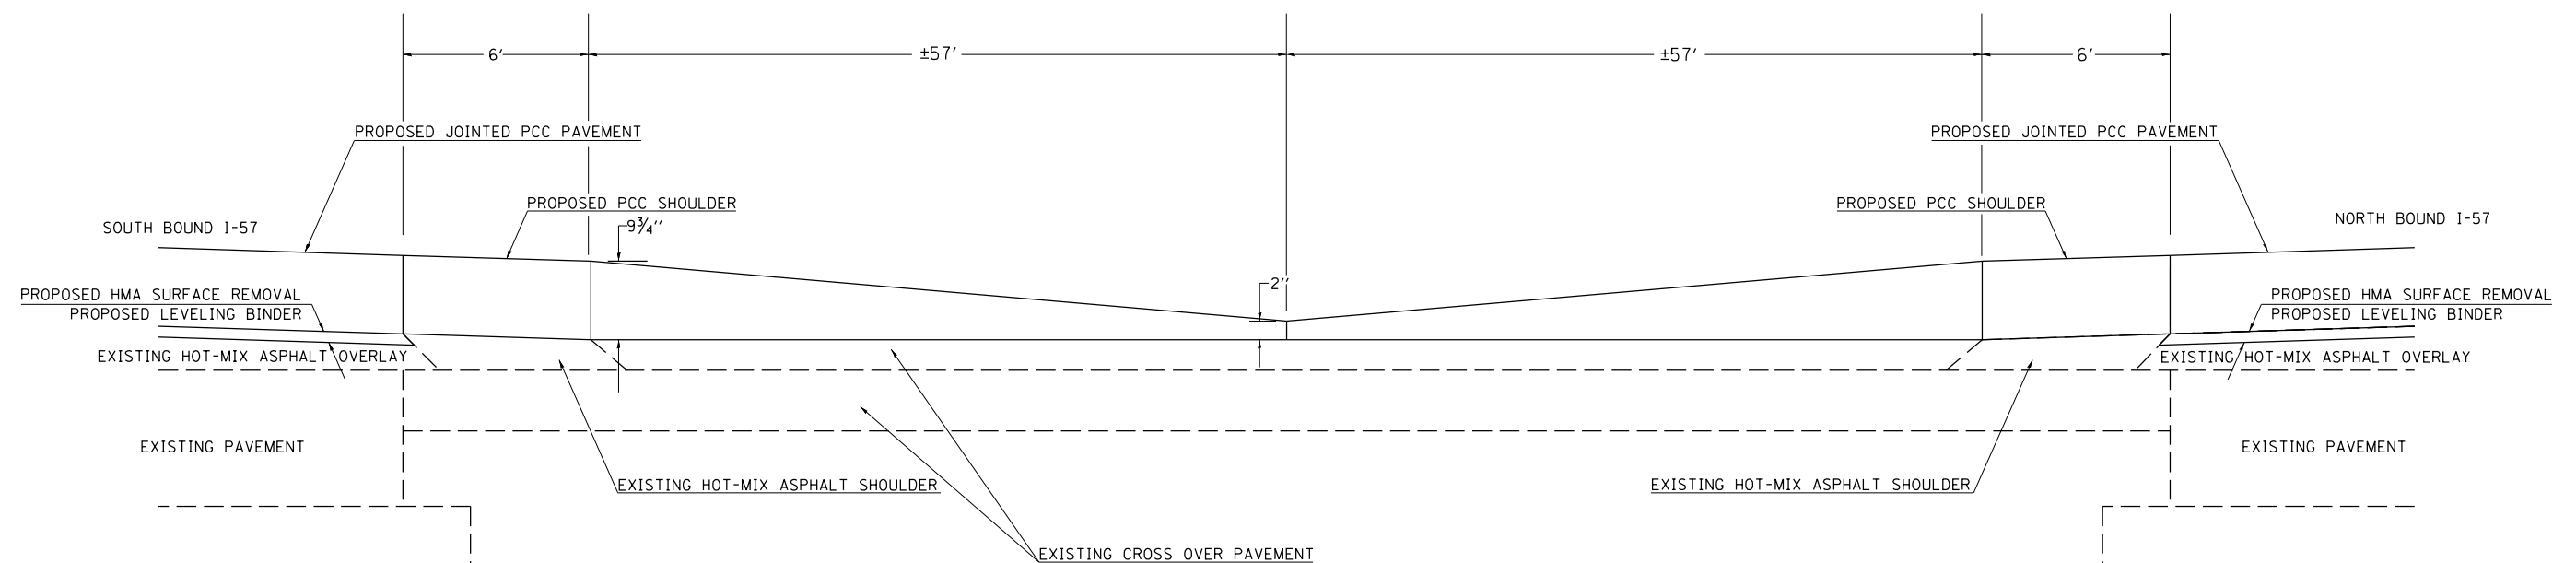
DETAIL OF MEDIAN CROSSOVER PLAN VIEW
